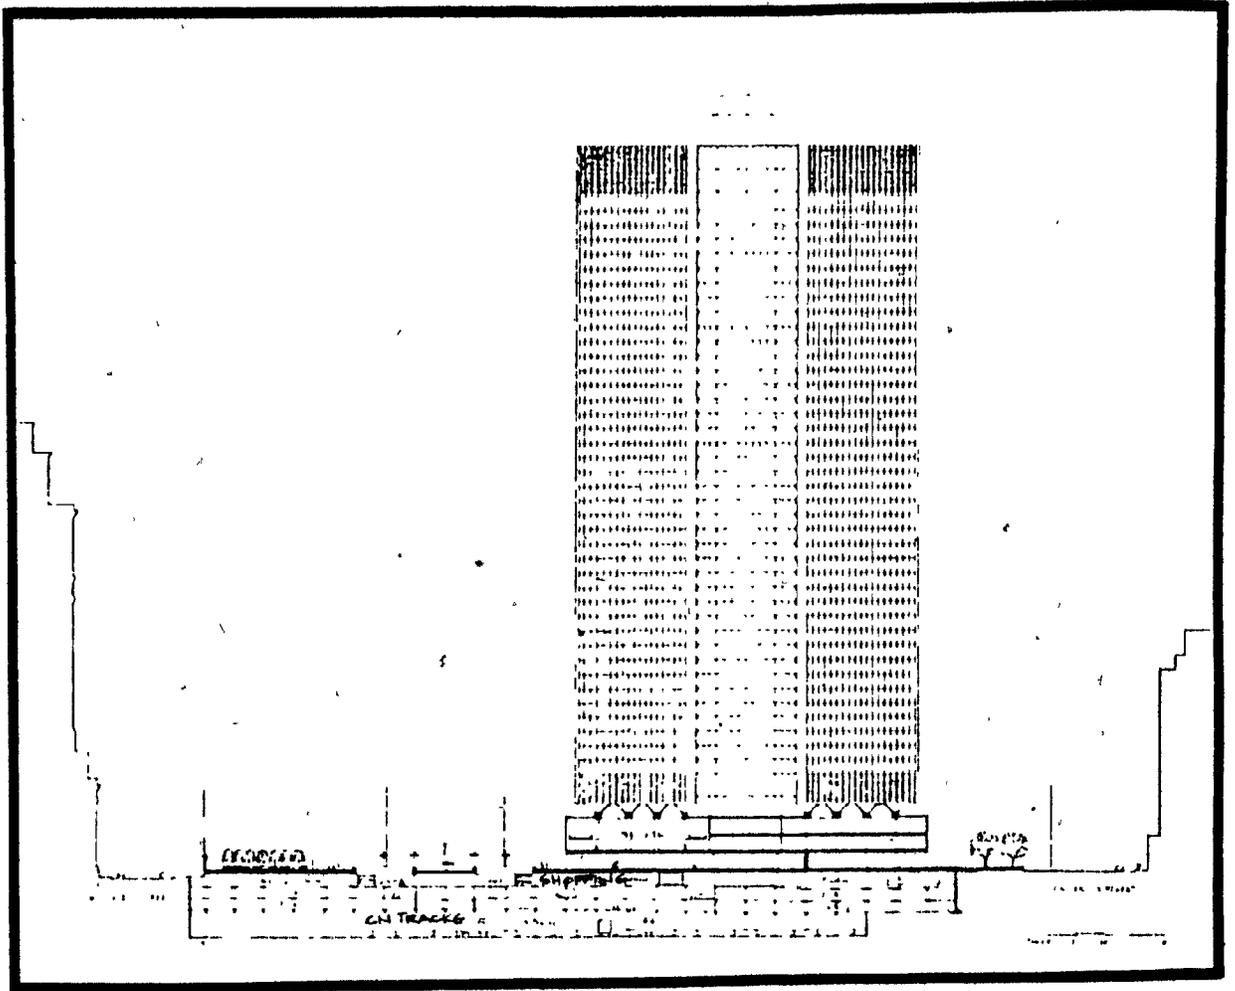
PVM, East West Section looking north from Dorchester Boulevard.
